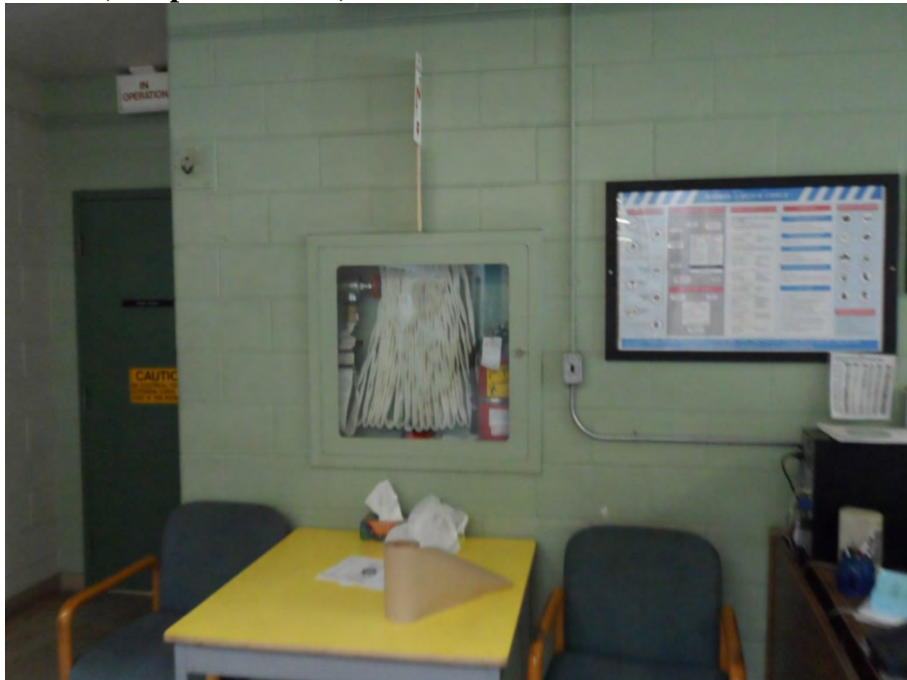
Main Building Room 123 Light green interior wall paint – Lead-containing (Sample 123-P-18).
